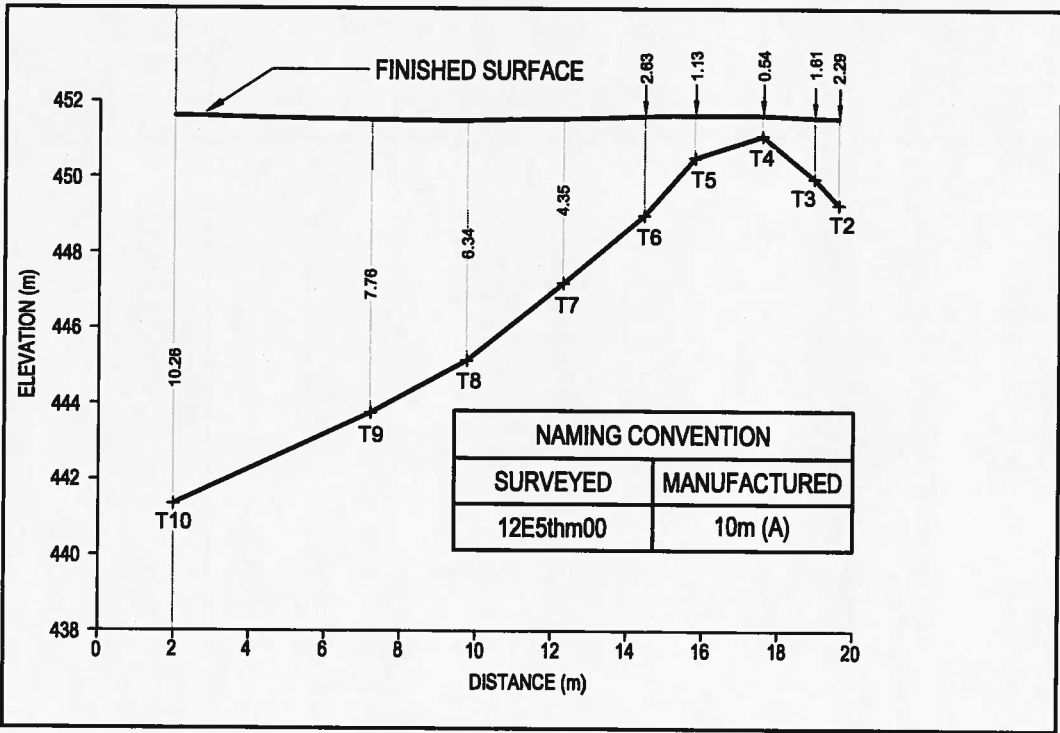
12E5thm00 (10m (A)) - AS MANUFACTURED, PLAN, AND SECTION
